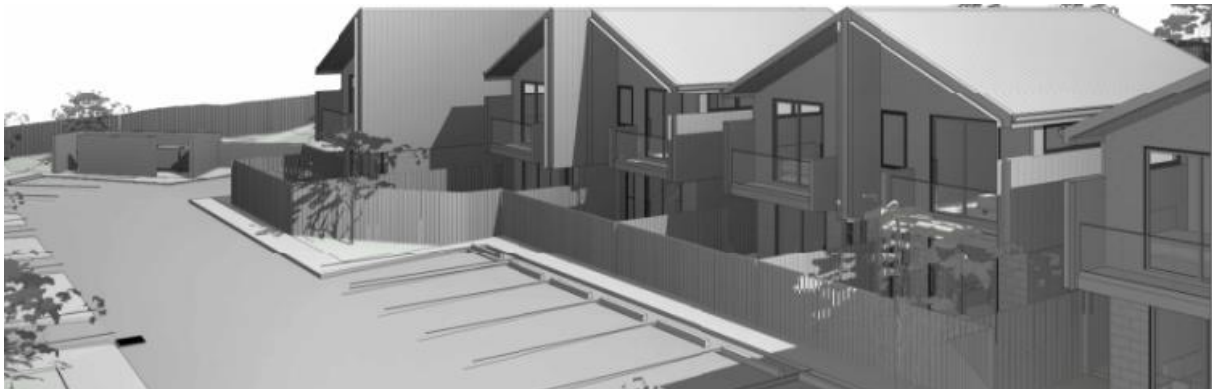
Shows the internal driveway and proposed dwelling units on the south eastern (higher) side of the site – image extract from cover sheet as prepared by Jaws Architects
